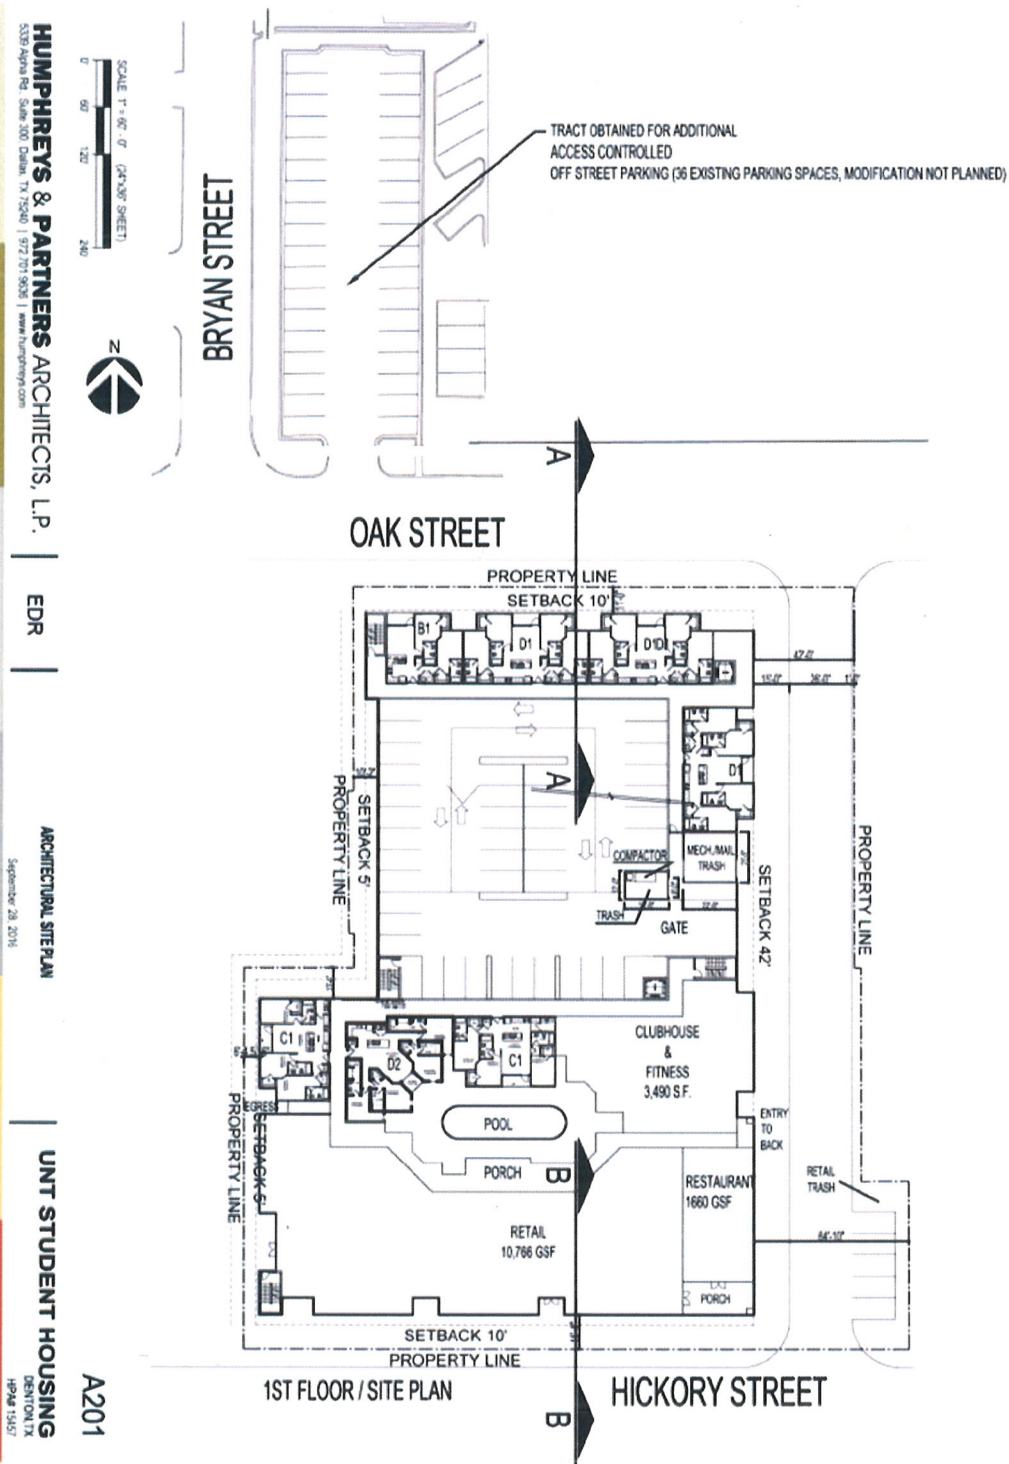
F. Subarea C Site Plan – Data Table
